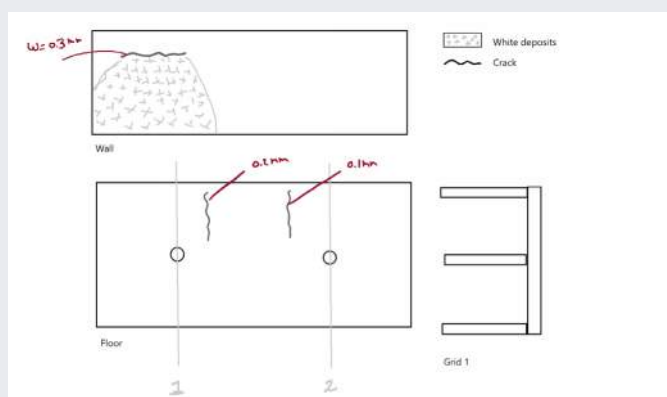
Damage recording by drawing in plan and facade drawings
